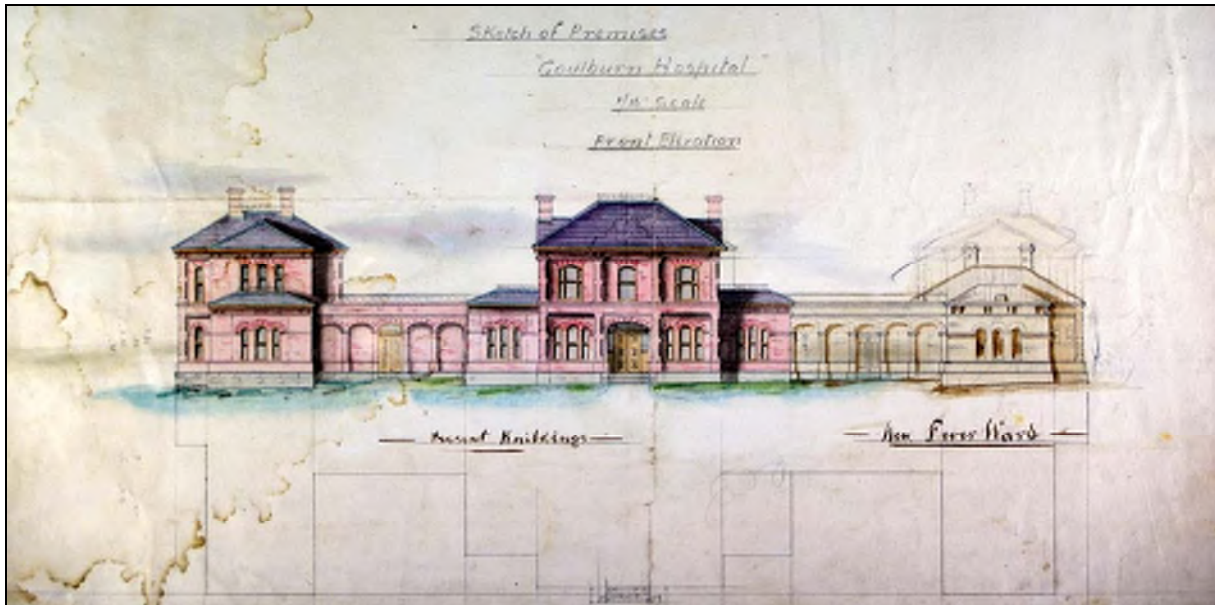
Undated elevation by Manfred showing the additional pavilion (“New Fever Ward”) which appears to have been constructed shortly after. (Source: Goulburn & District Historical Society Inc, MC0178ai)
